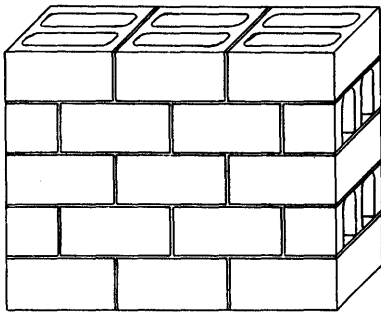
8-INCH SAND AND GRAVEL TILE WALL
